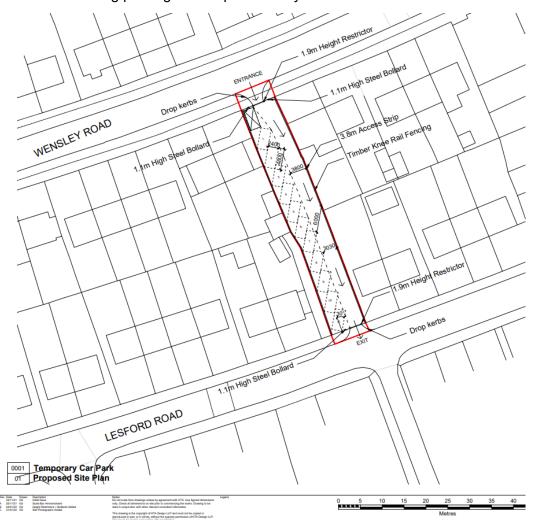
Extract of Temporary Parking Plan (HTA-A DR 0003 Rev C)
